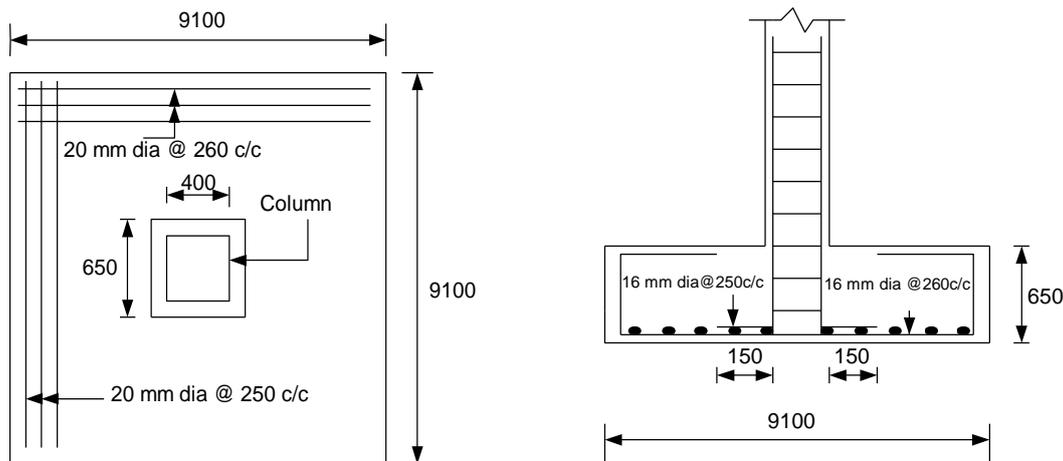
Placement & Elevation of reinforcement for footing without geocell
